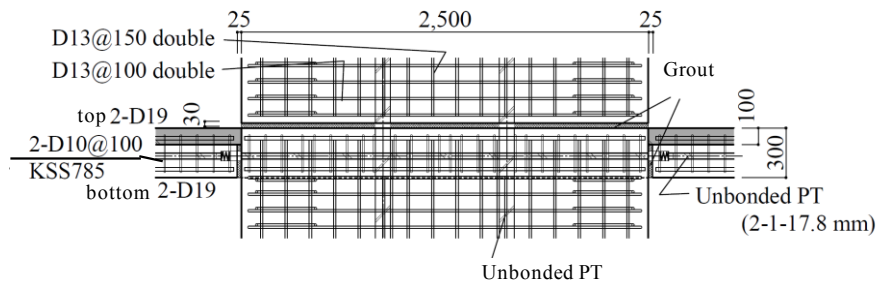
Beam-to-wall connection detail at 3rd floor (dimensions in mm) from Nagae et al. 2012
